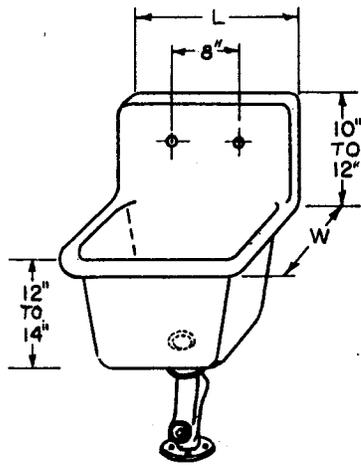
KITCHEN SINK OUTLET DIMENSIONS.
